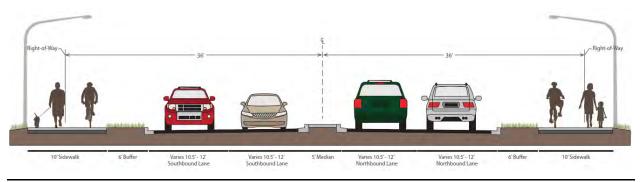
Proposed Typical Section – Hollis Street to NE Riddell Road
